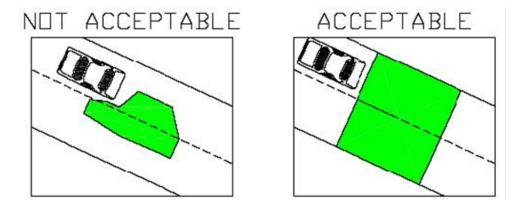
Example 1: Do not construct patches with angled sides and irregular shapes.
